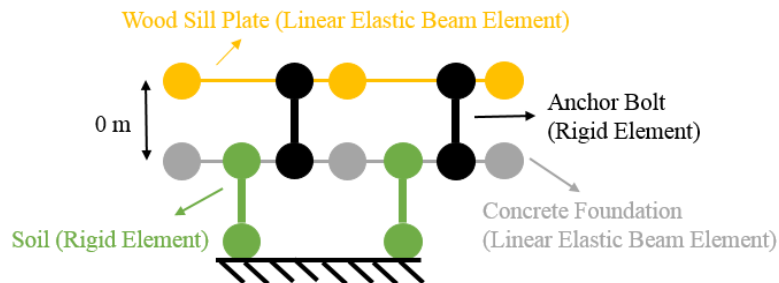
Base elements for archetype models, showing the wood sill plate, hold downs, anchor bolts, concrete foundation, and soil elements.
